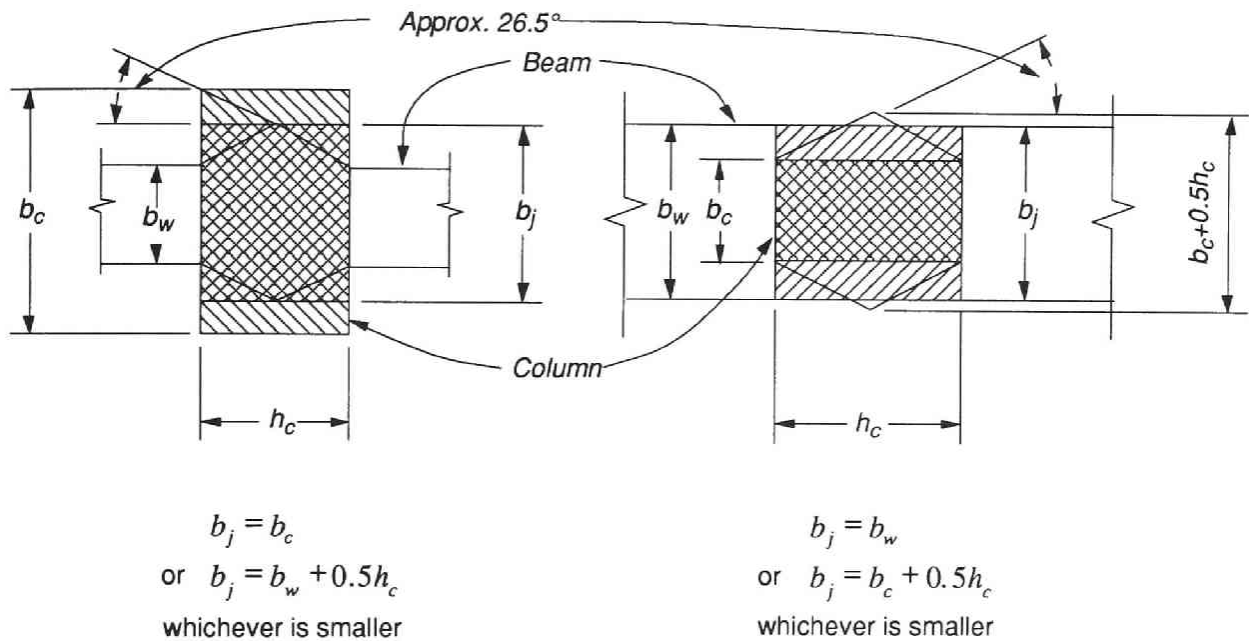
Design of beam - column joint according to NZS 3101:1982
